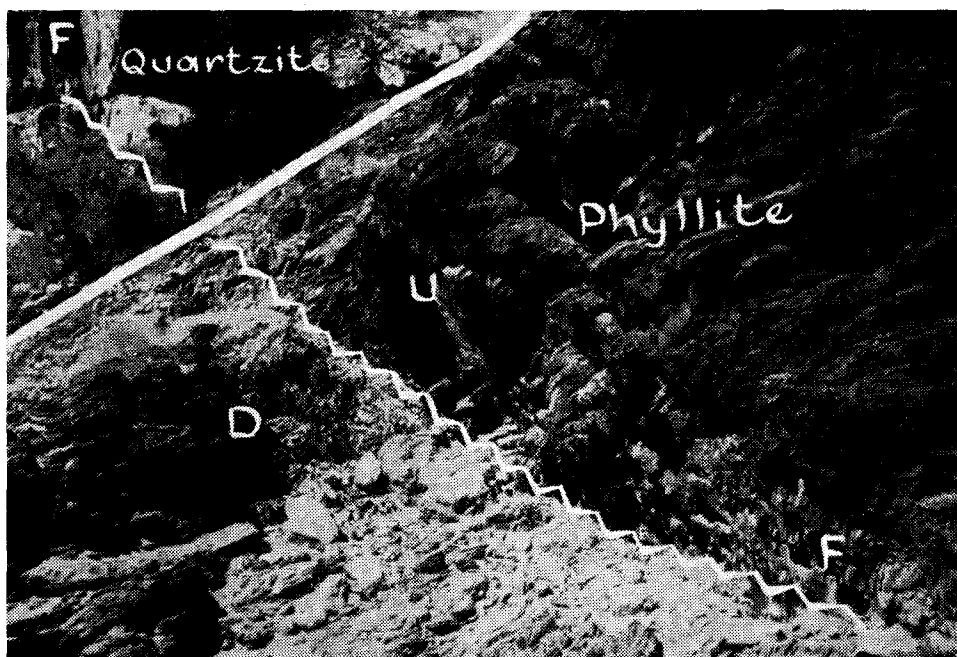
Western Abutment looking South showing minor faulting.
